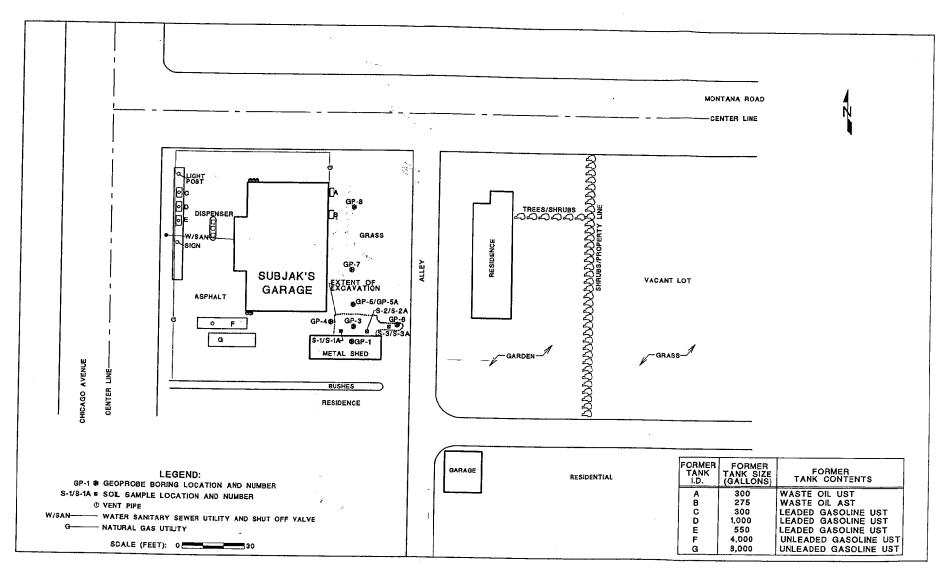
SITE FEATURES, BORING, AND SOIL SAMPLE LOCATIONS SUBJAK'S GARAGE SOUTH MILWAUKEE, WISCONSIN
